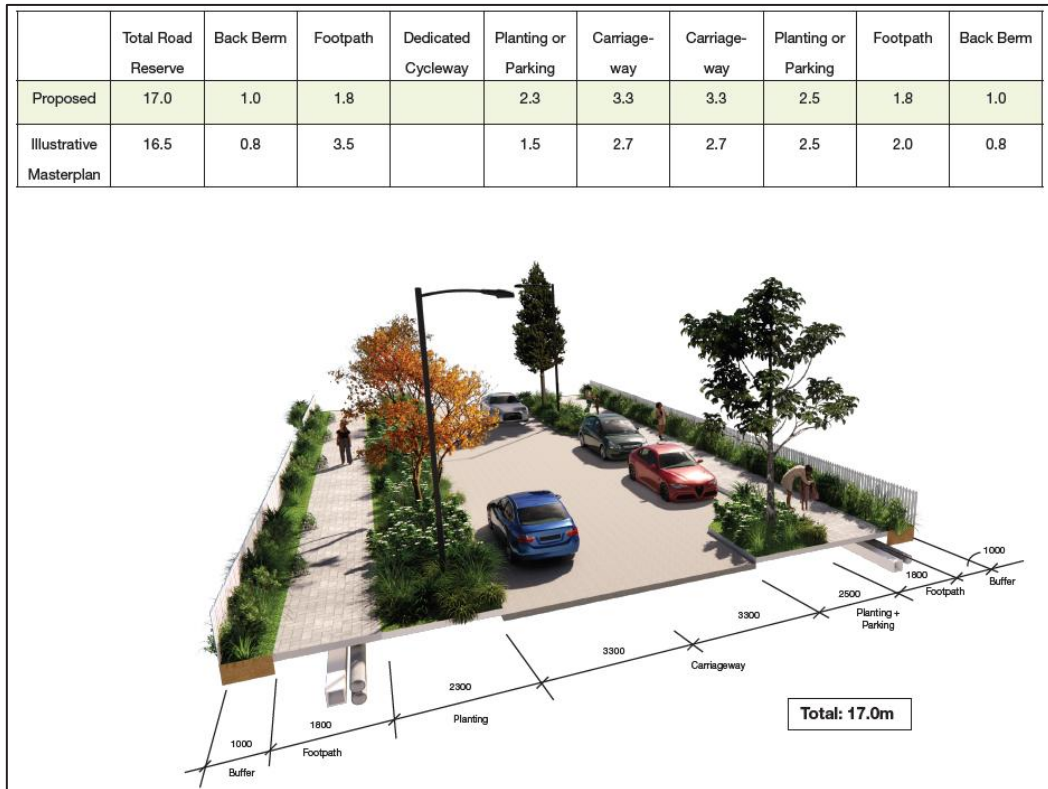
Road design table and illustrative cross-section for Local Street (Wide Industrial).
